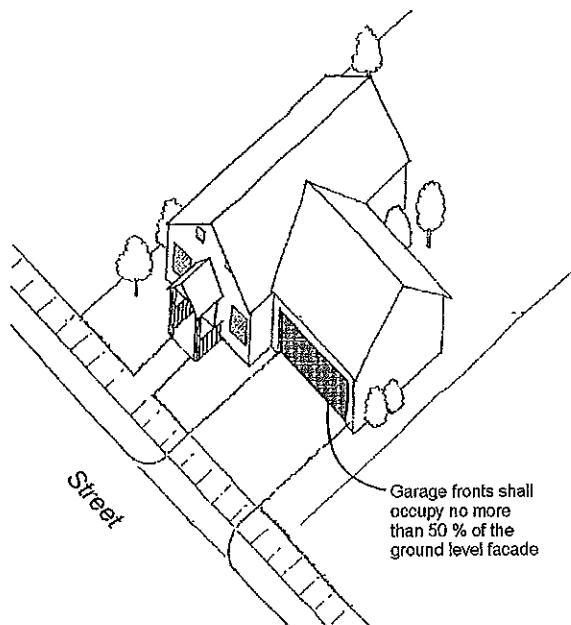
Where a garage wall faces the street, it shall occupy no more than 50% of the ground-level facade.
